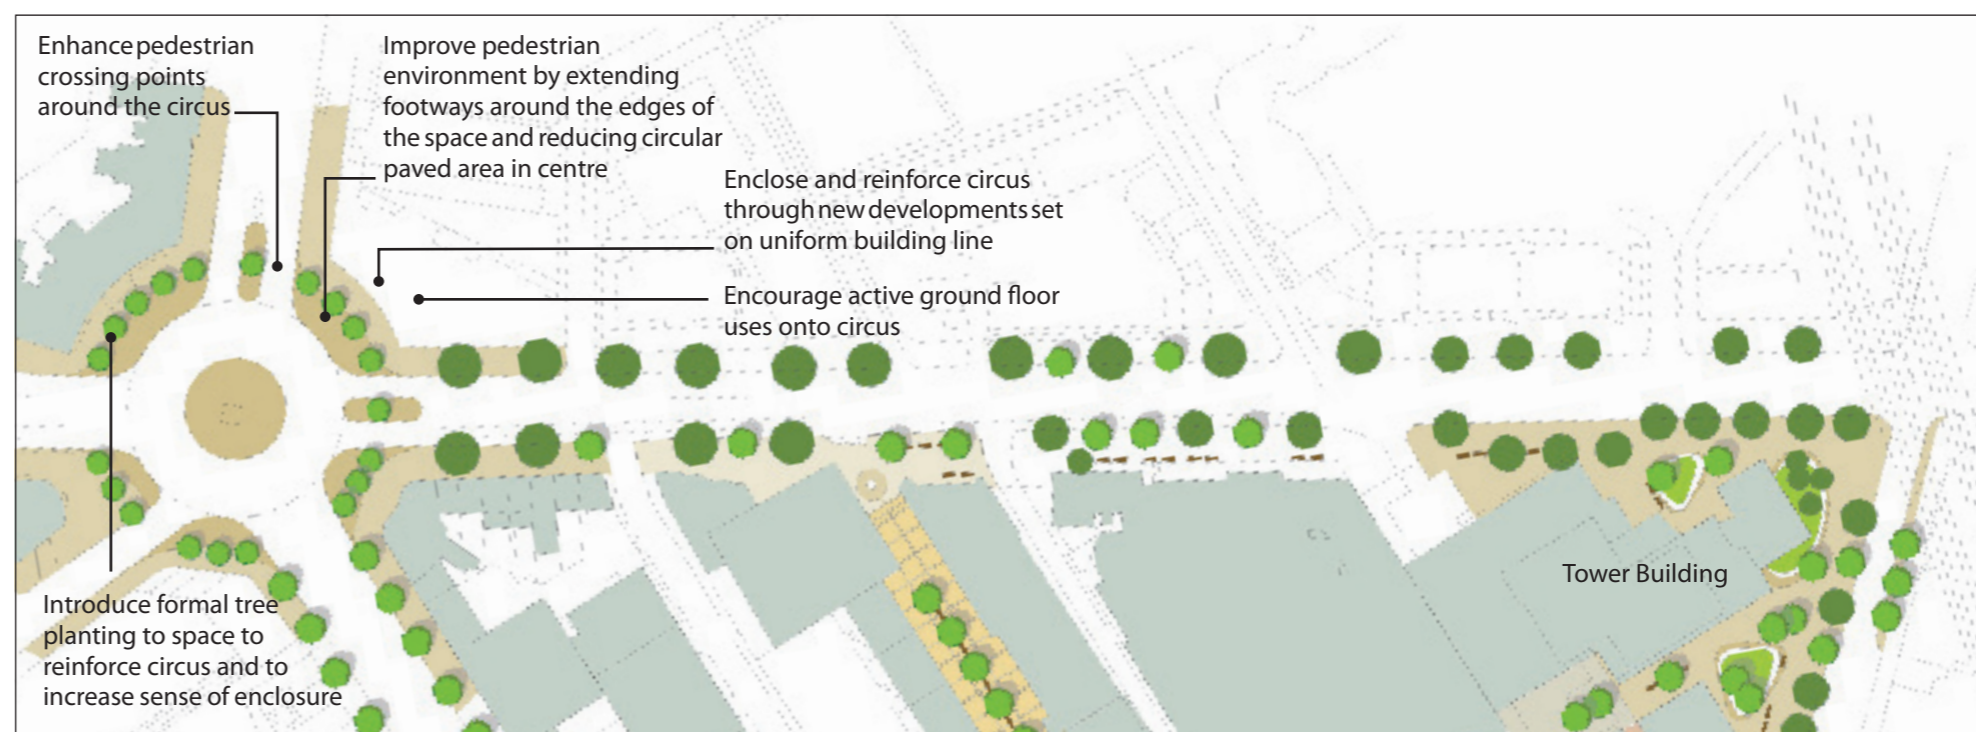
Illustrative plan of St. George's Circus Gateway
